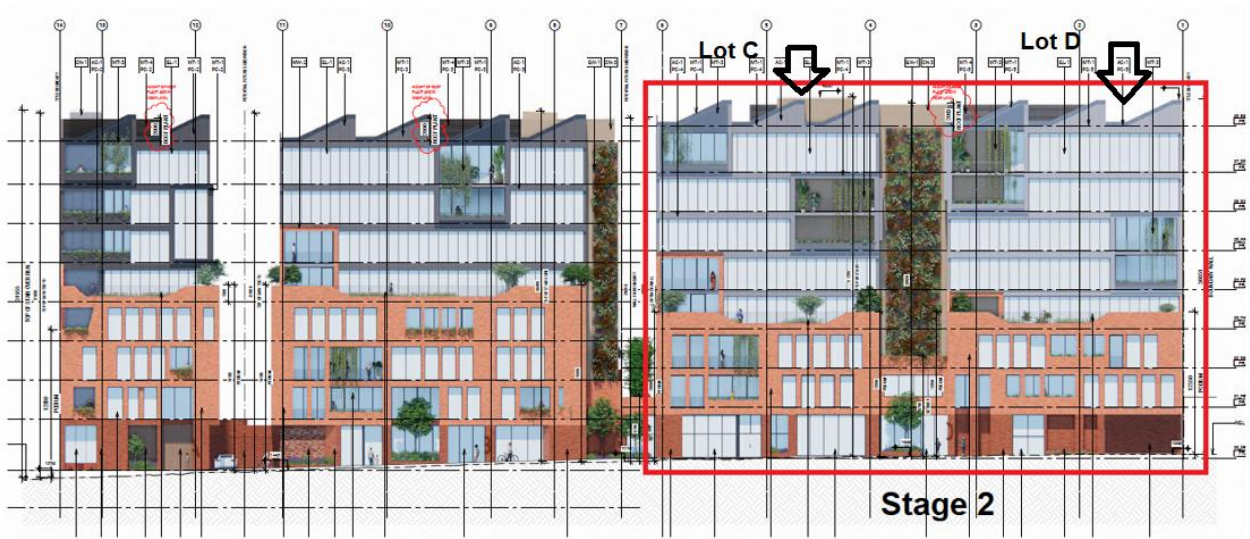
Proposed Duke Street elevation with Stage 2 highlighted
